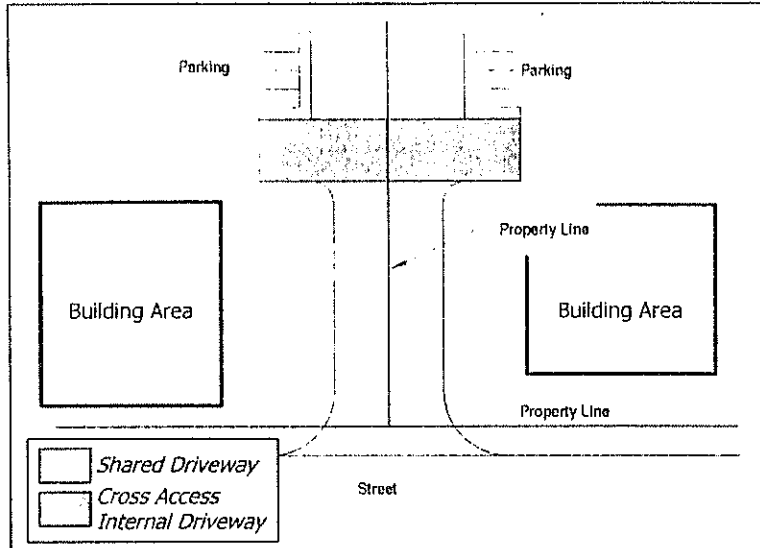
Shared Access Driveway & Cross Access Internal Driveway
